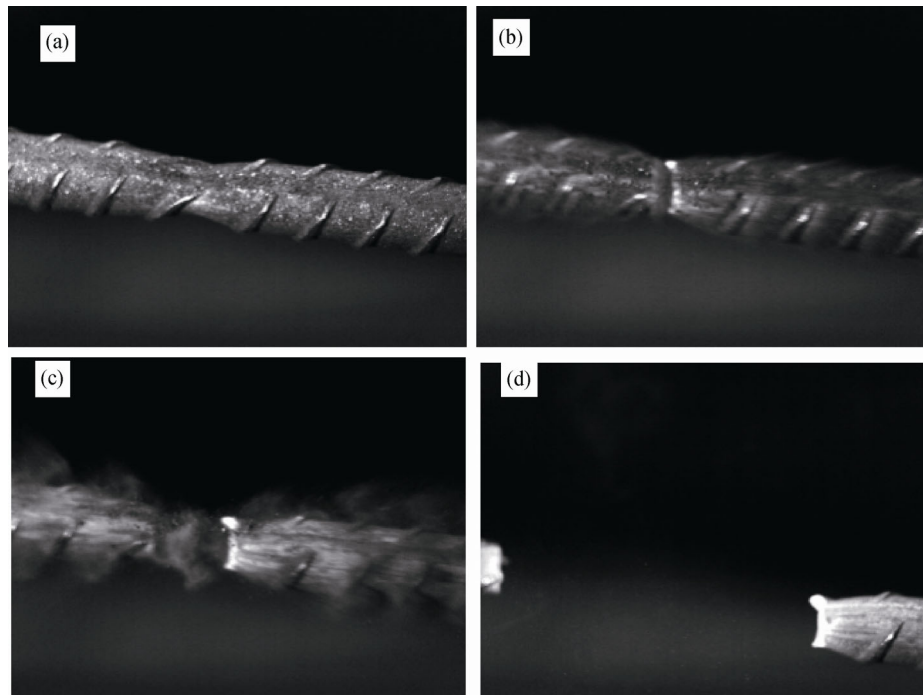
High-speed photography of the rebar bolt necking phenomenon: (a) necking phenomenon; (b) plastic failure; (c) moment of tensile failure; (d) after tensile failure.
